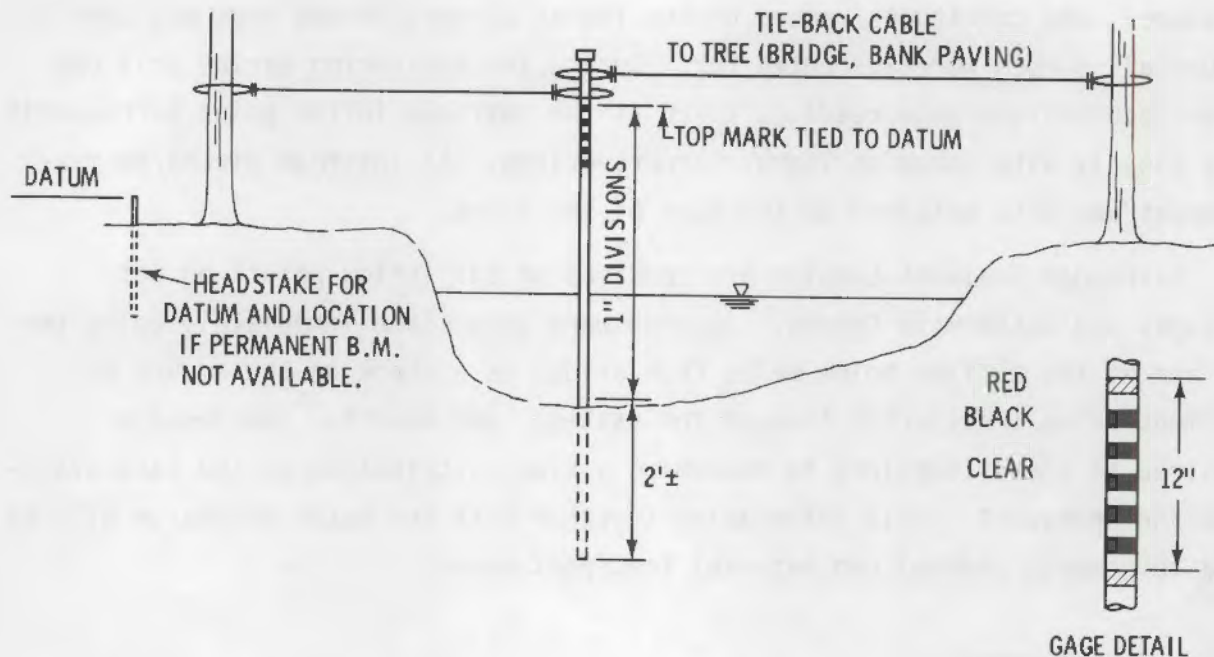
Typical Staff Gage Installation for Recording Changes in Water Surface Elevation
